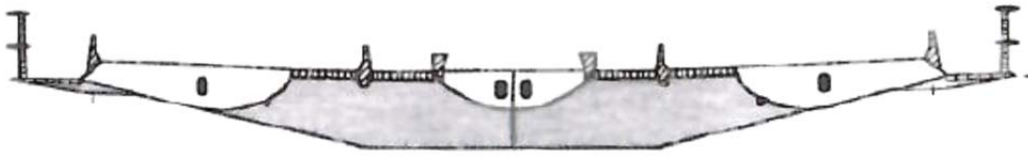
Scetch of cross-section for the Messina Bridge [4]
